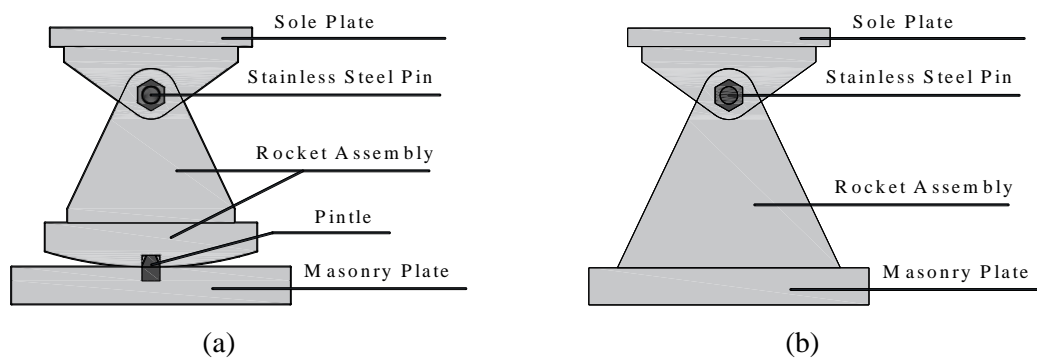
Sketch of (a) a rocker bearing; (b) a pin bearing.
